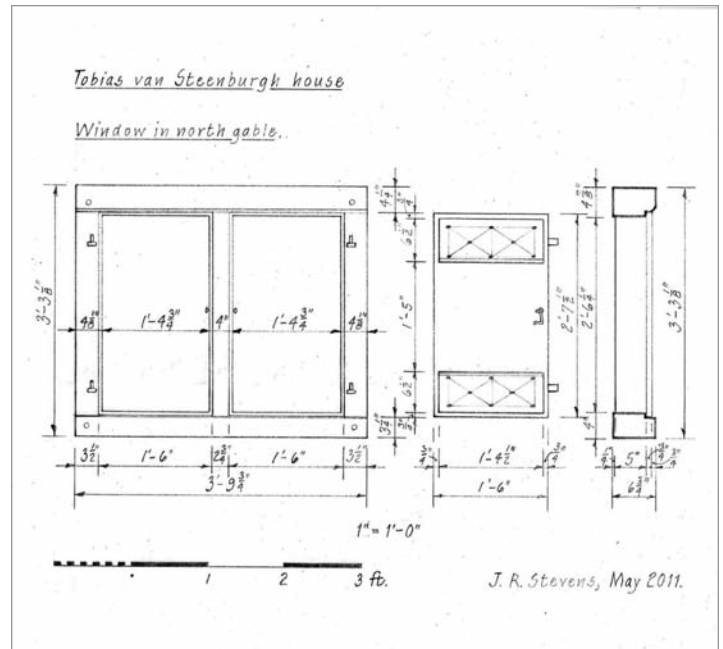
Tobias van Steenburgh House, detail, original window in north gable end.
